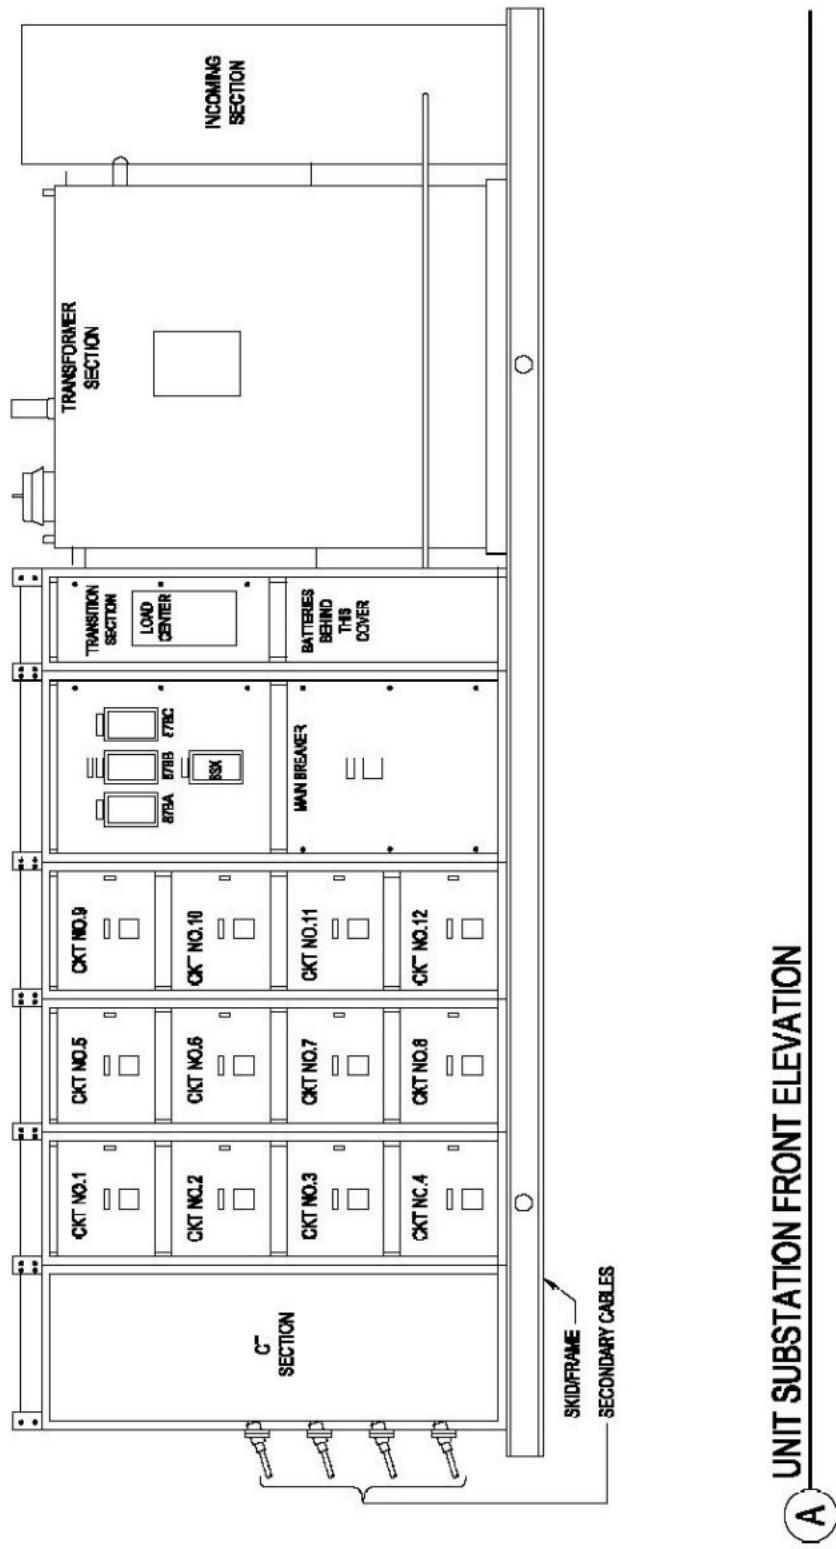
F (Electrical System for a Double-Deck Pier (6 of 9)
